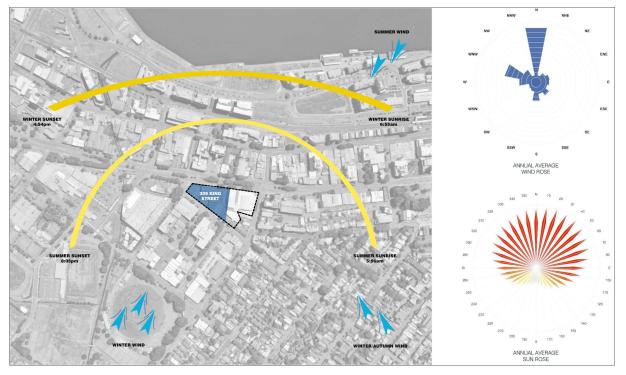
Extract of Climate plan (Source: Plan DA003, Appendix 2)
